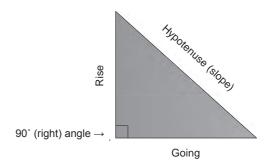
A pitch board is simply a piece of hardboard (or similar) cut to the shape of a right-angled triangle; it is useful for marking out the steps on a pair of strings.
